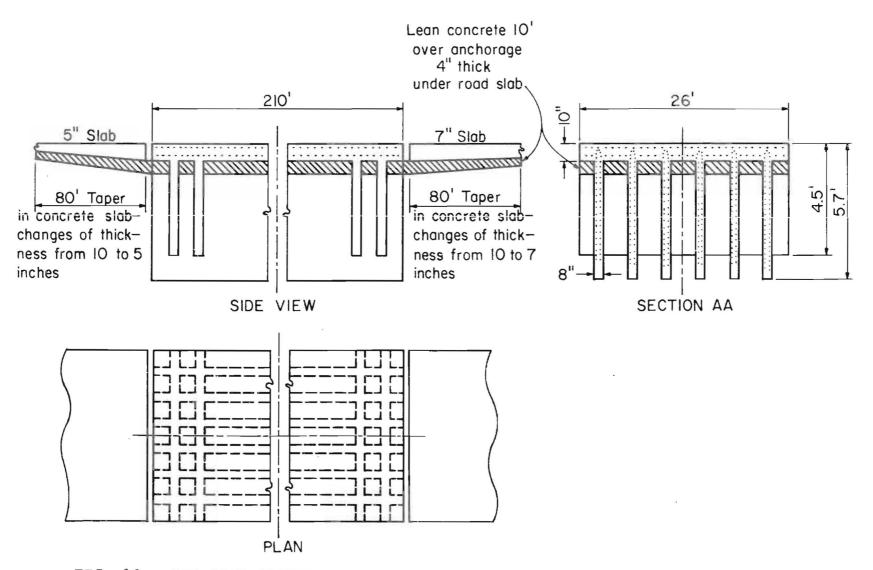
RIB SOIL ABUTMENT FOR PRESTRESSED PAVEMENT AT WINTHORPE, ENGLAND
